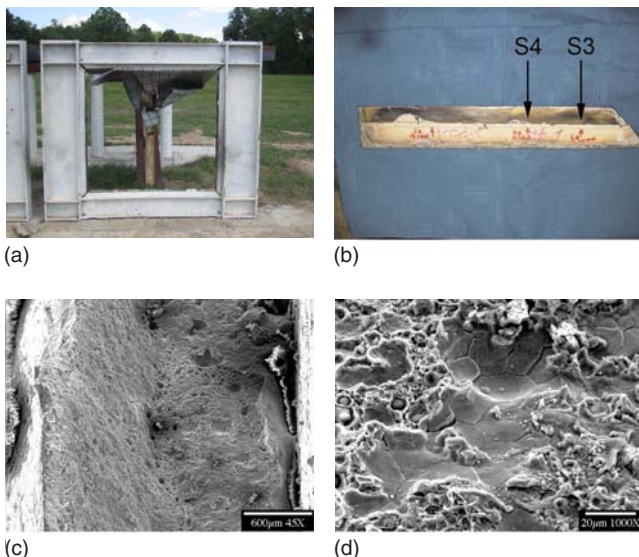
Photograph of SPSW 2 following Test 2: (a) front elevation; (b) removed fishplate section; (c) 45 \times view of Section S3; and (d) 1,000 \times view of 0 degree base at Section S3
